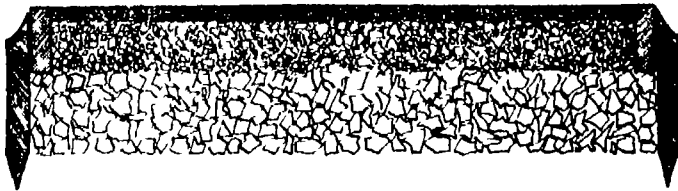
SECTION OF A CEMENT SIDEWALK PAVEMENT
